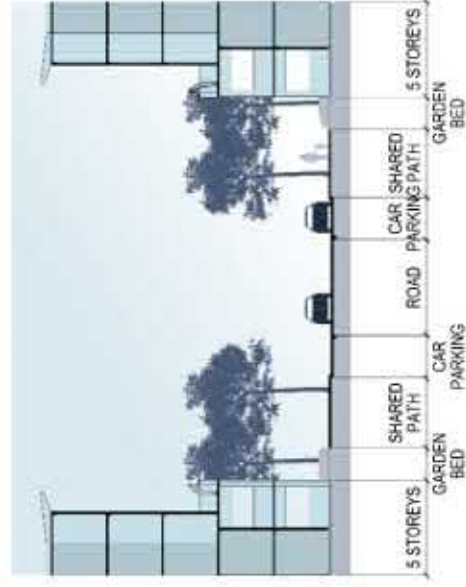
Central Streets (Plan Extract and Indicative Section)
